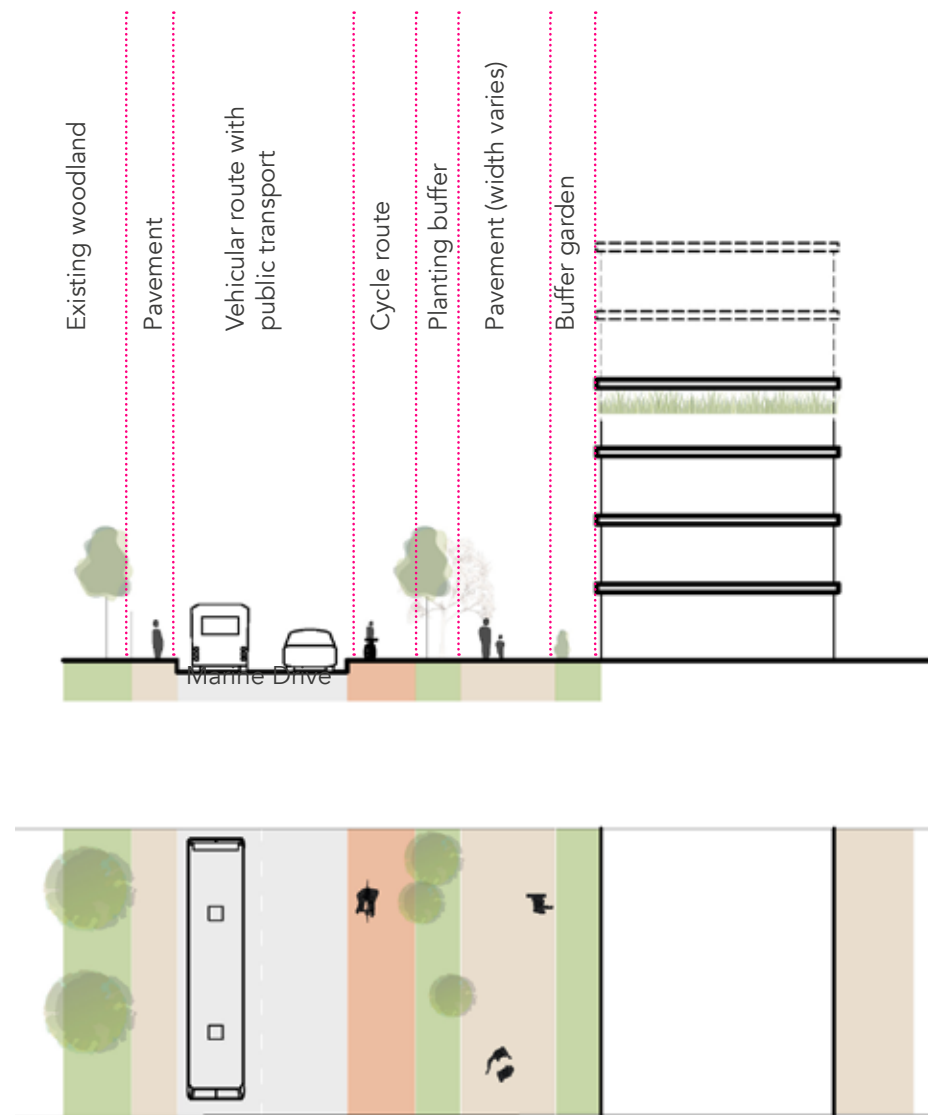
Illustrative section and plan for Marine Drive / West Shore Road
